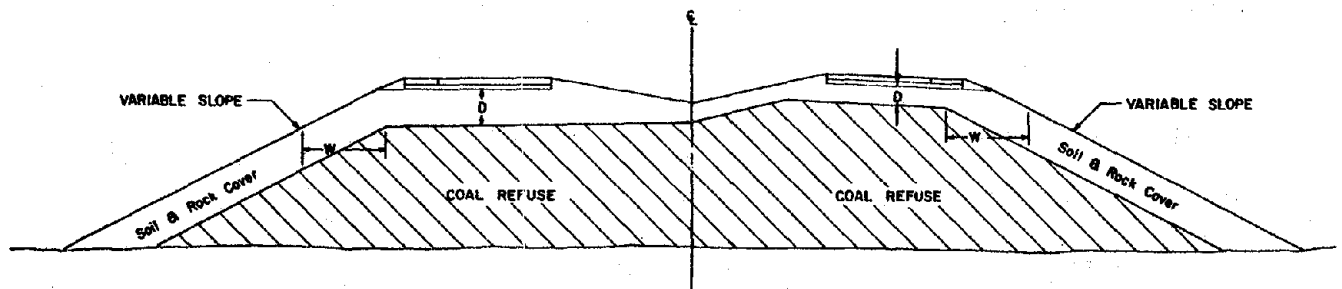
Typical Section of Coal Refuse Placement in Embankments.
